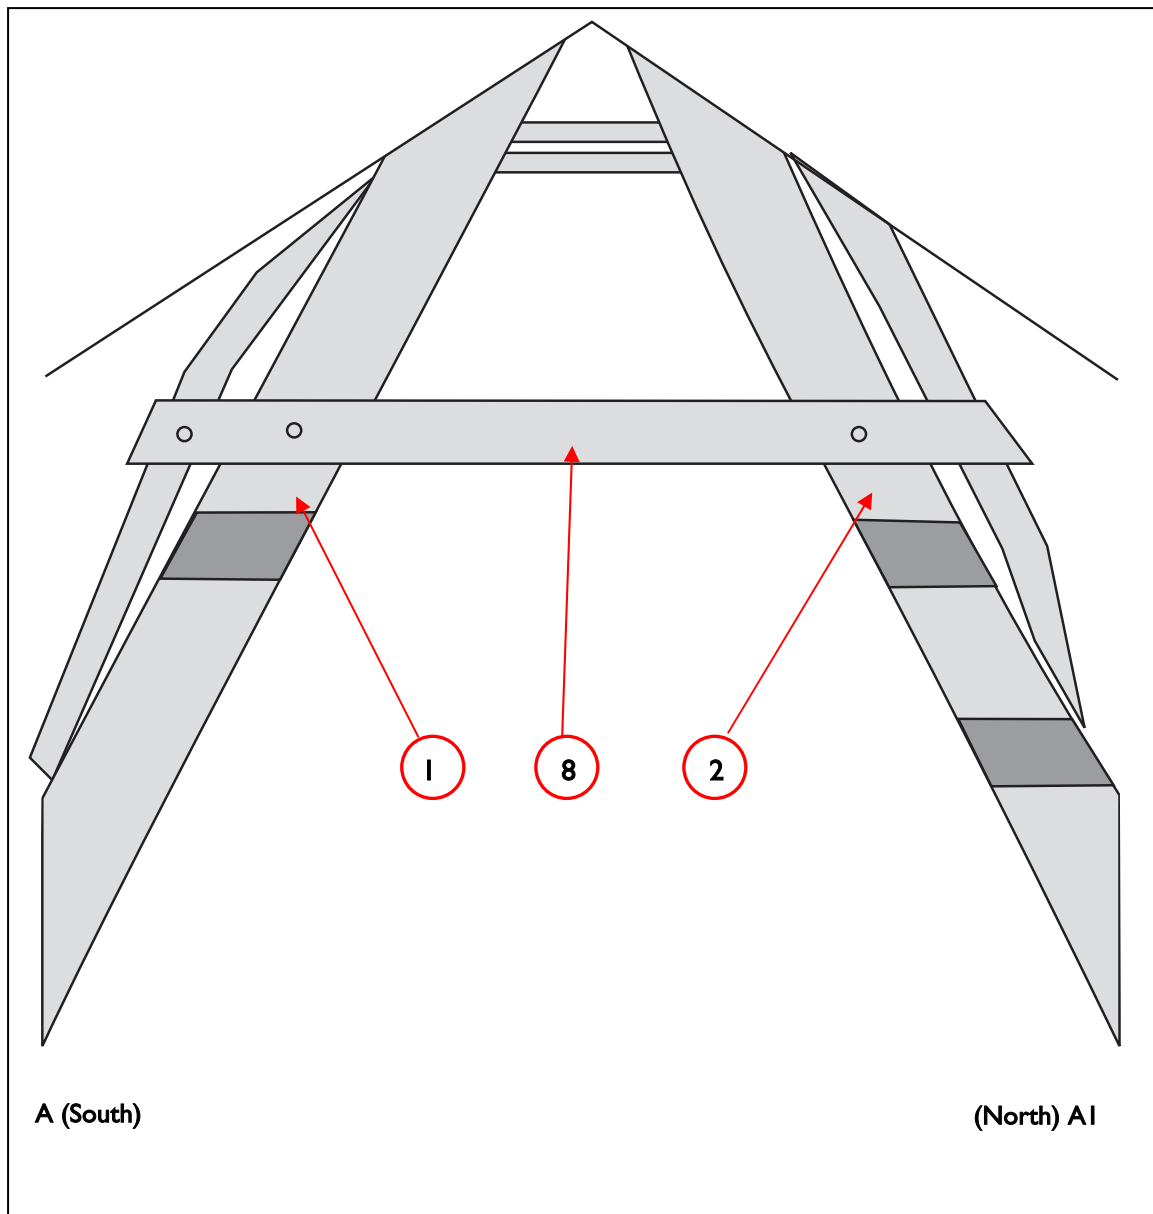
Barn I – schematic section of cruck truss A-A1 (truncated by modern roof line) to show sampled timbers. Shaded areas indicate redundant half-lap joints (viewed from the east looking west)
